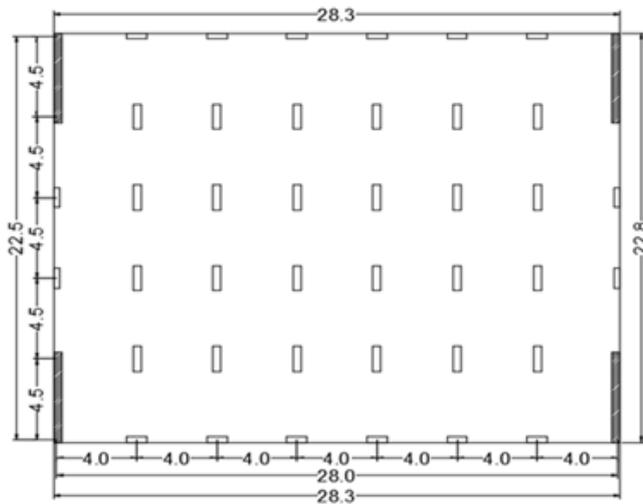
Model (4) Building with Shear Walls at exterior perimeter parallel to Y-direction.
